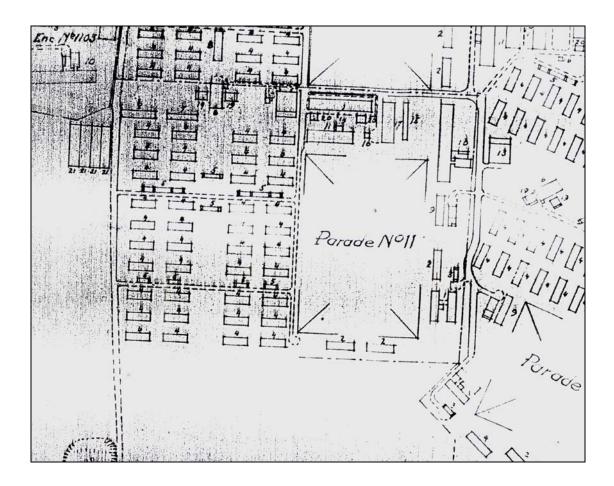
A typical battalion unit at South Camp. The barracks, and washing and cooking amenities are to the west of the parade ground, the HQ buildings are located to the south and east, and the storage and transport facilities such as stables are to the north. Canadian National Archives Reference: Q4-54887, Series E-17, Vol 21, File '21' (21-27) 1916-C 'Plans de camps' Crown Copyright, The National Archives, UK.
